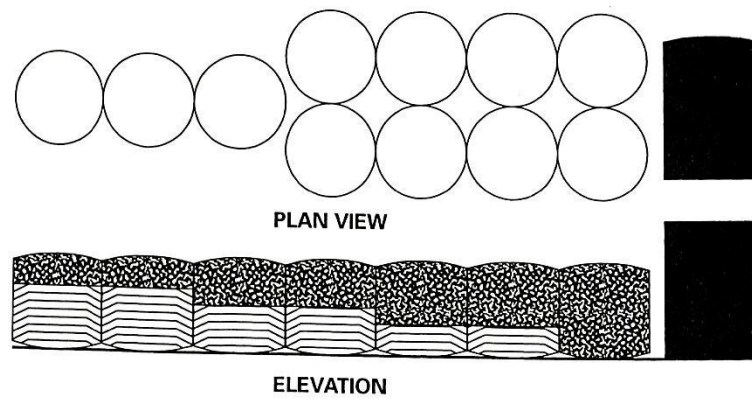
/5: Configuration of Example sand-Filled Plastic Barrels. (Crash Cushions)
